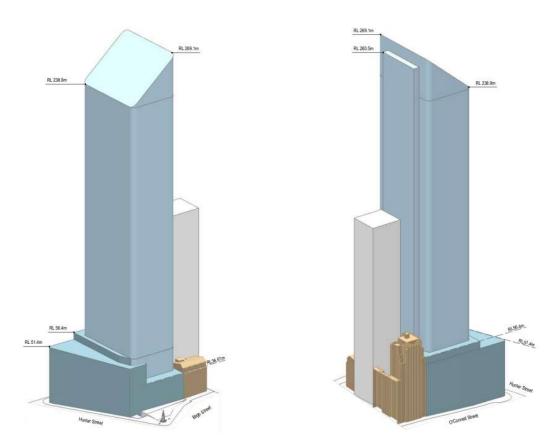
3D view of the proposed planning envelope Hunter Street East site provided by FJMT
